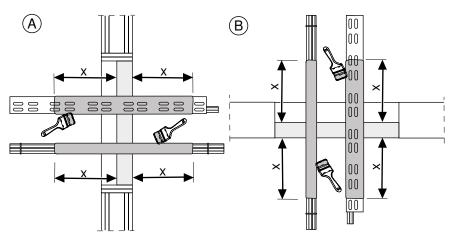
Ablation coating on cables in wall (A) and ceiling (B)
